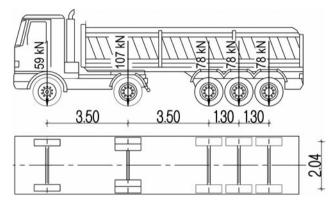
A single vehicle used in the load test, with details on its wheelprints, dimensions and axle loads given.
